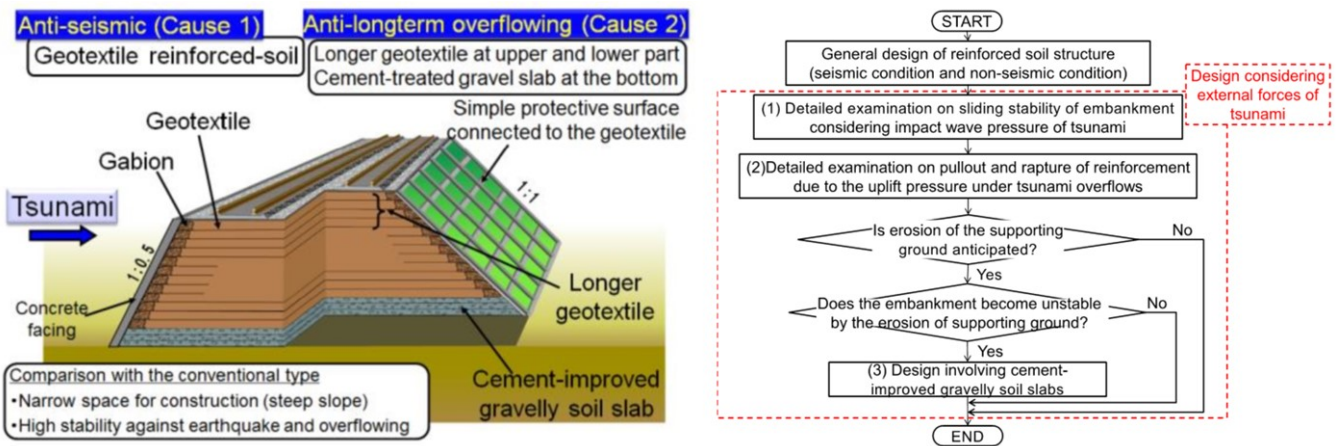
New geotextile reinforced-soil embankment for railway and design flow of the embankment structure considering tsunami effect proposed by RTRI (Watanabe et al., 2017).
